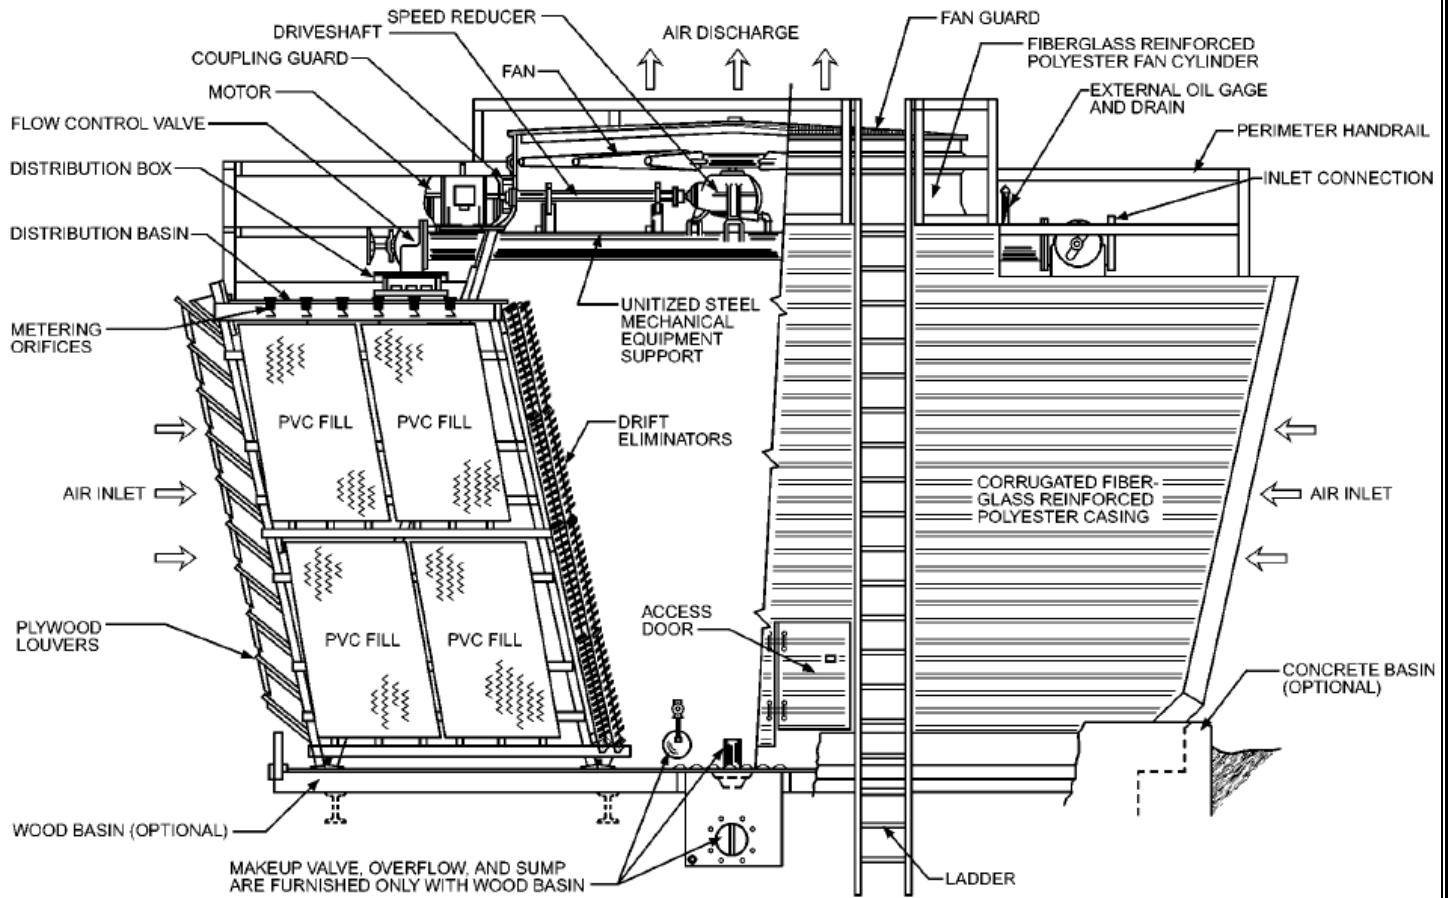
Field-Erected Cross-Flow Mechanical-Draft Cooling Tower
